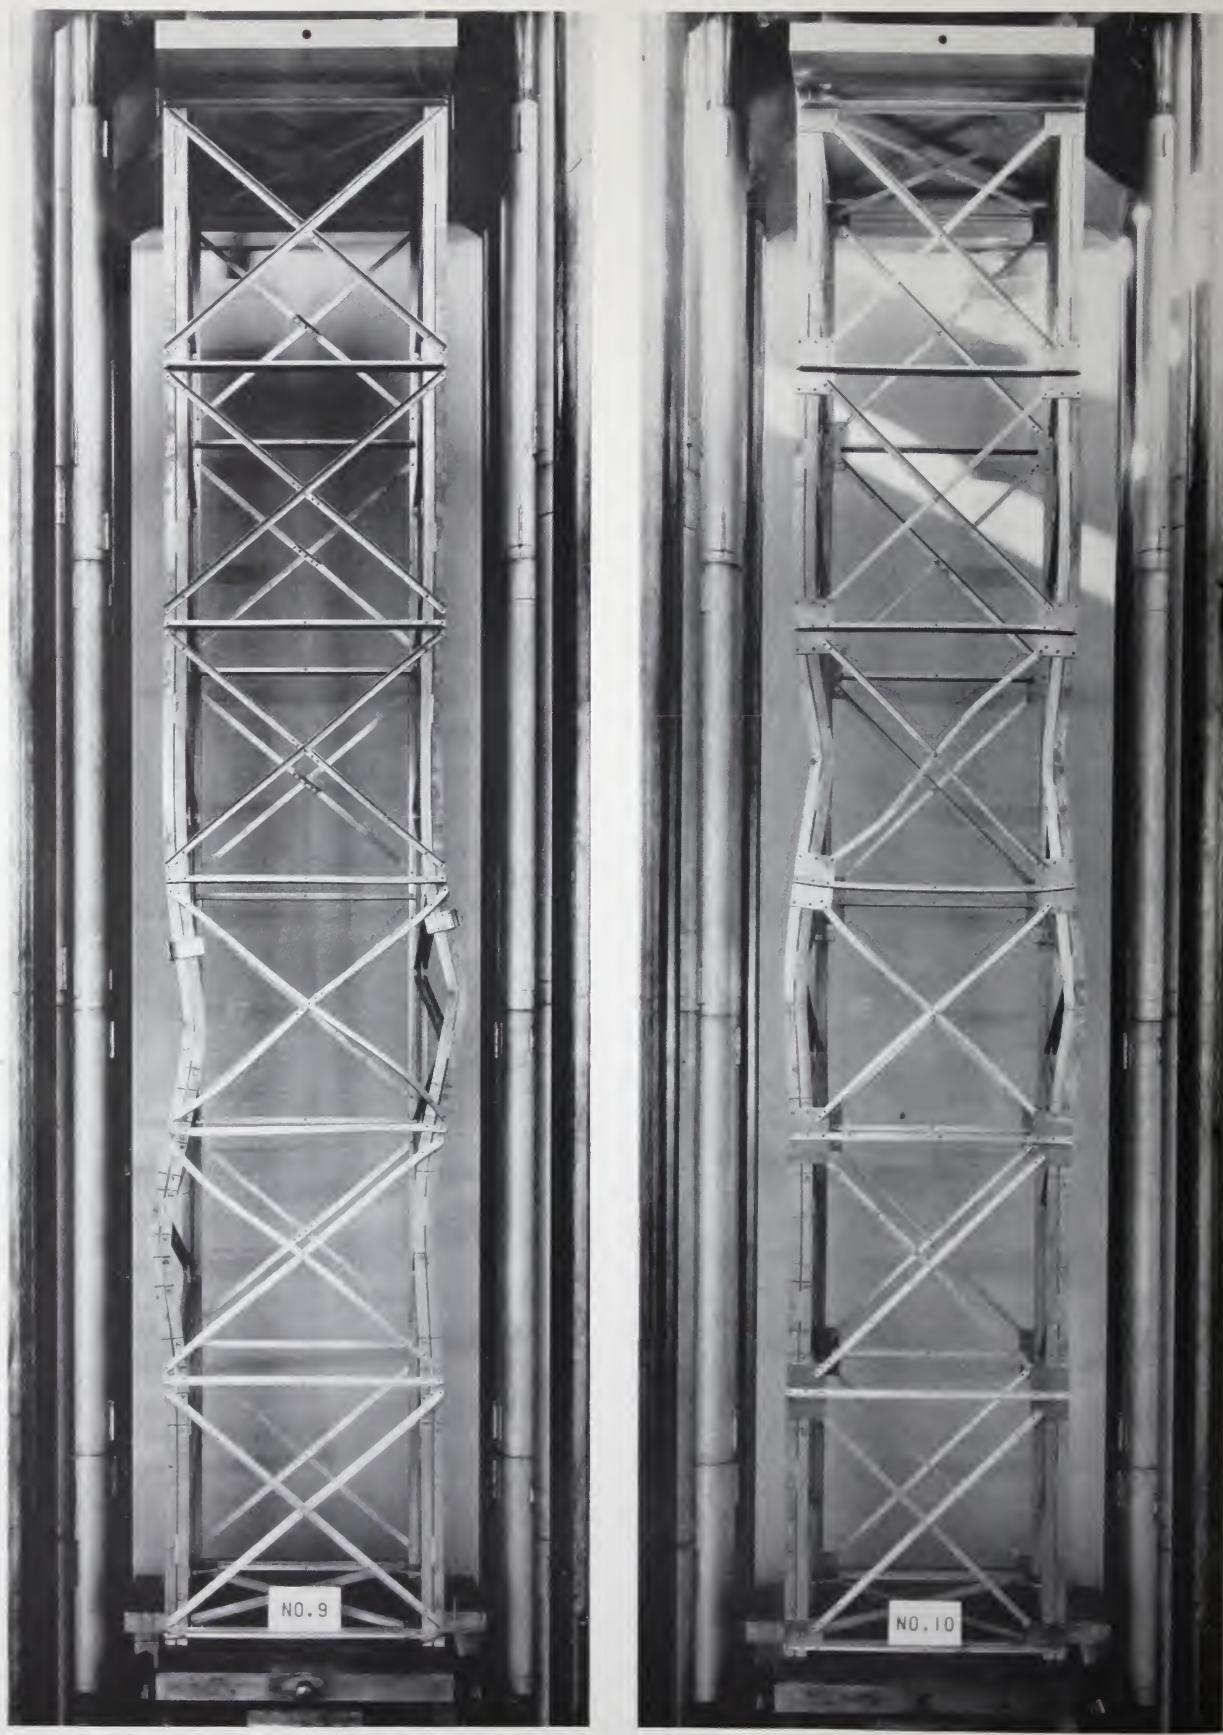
FRAMES NO. 9 AND 10 AFTER FAILURE IN COMPRESSION TEST.
